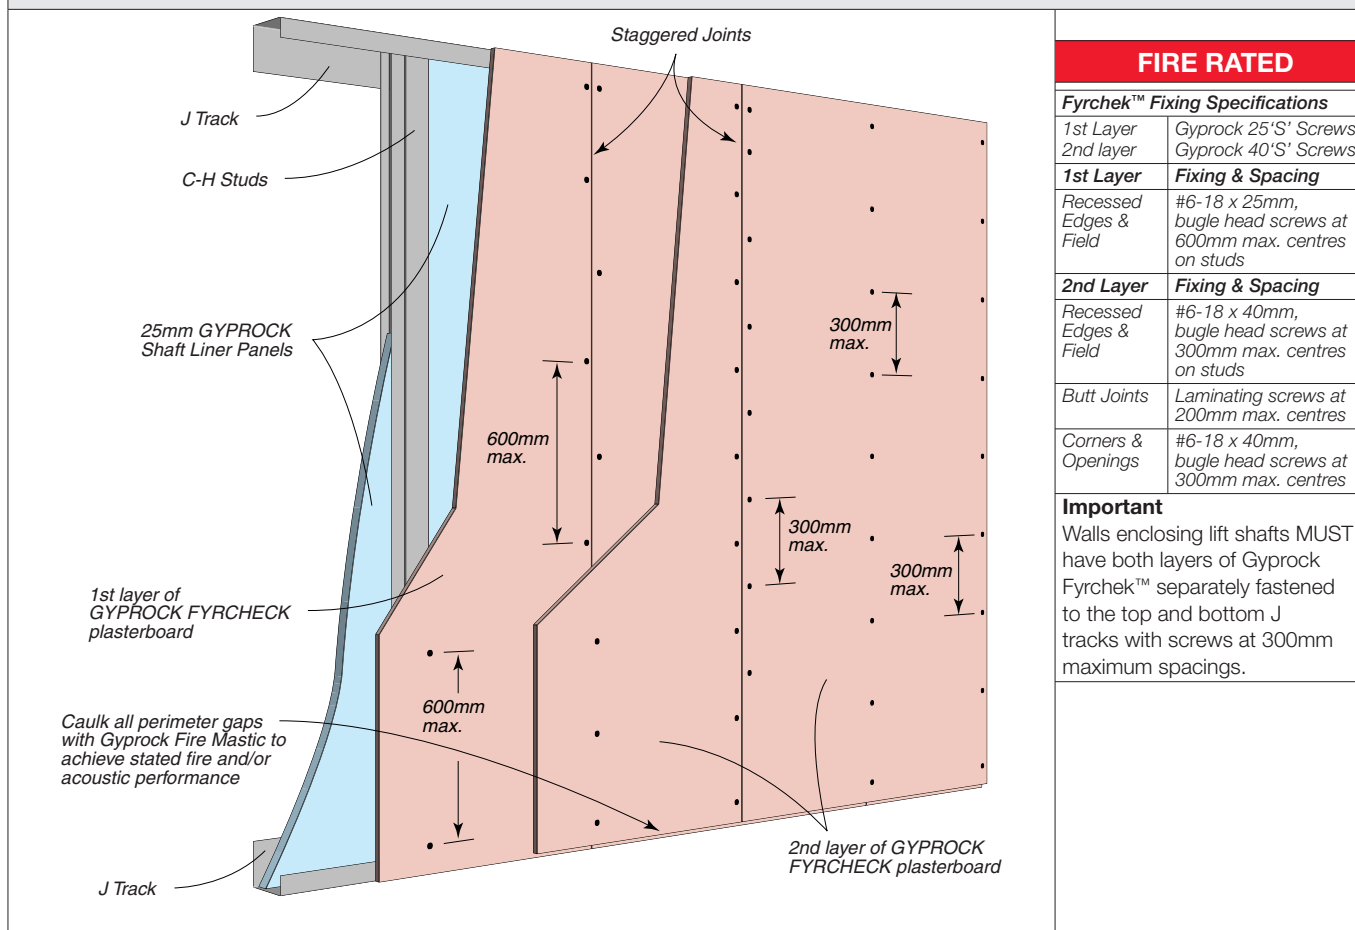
INSTALLATION DETAIL FOR SHAFTWALL SYSTEMS
